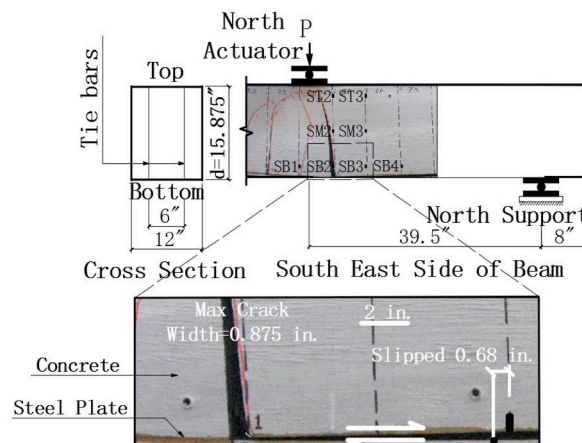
Failure pattern of SUC2-2.5–5.75-N
